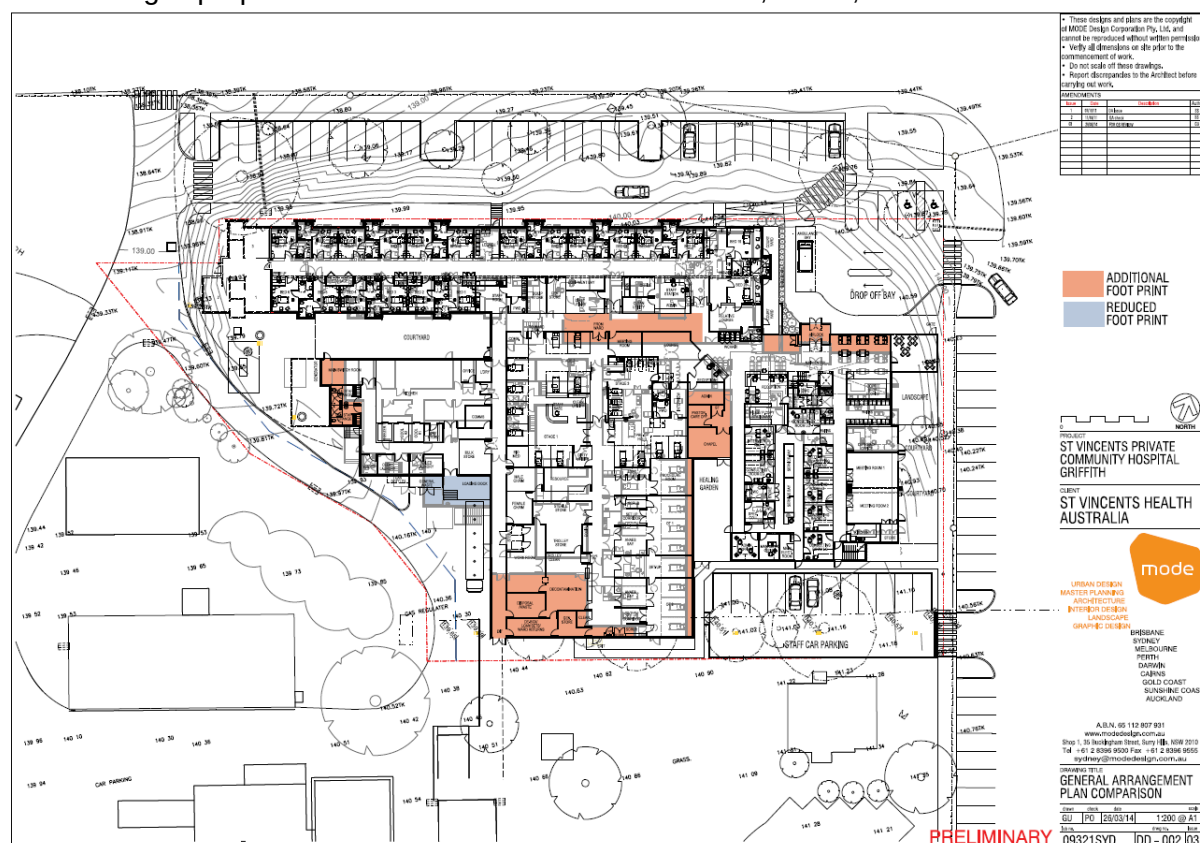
Modification to Floor Plan of the Private Hospital (Highlighted)
